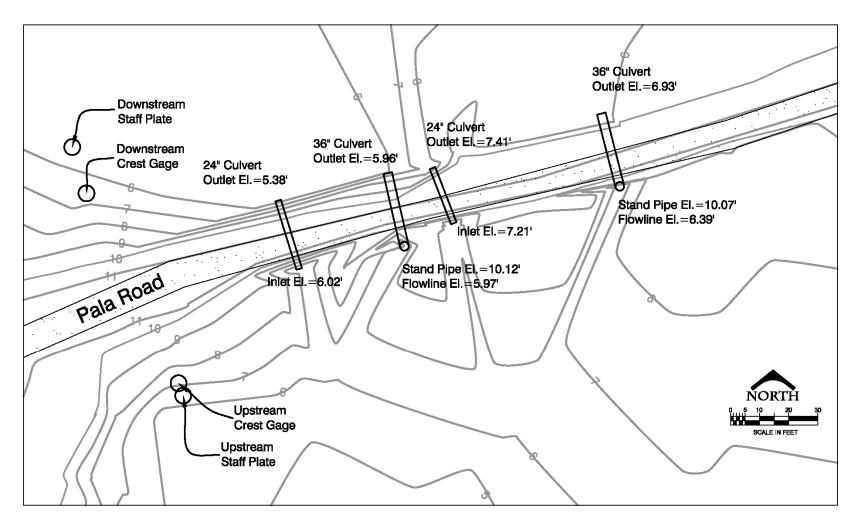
Plan view of Pala Road crossing Yontocket Slough, showing location and elevations of the two 24 inch free flowing culverts and the two 36 inch culverts with stand pipes. Also shown are the location of the staff and crest gages adjacent to Pala Road. All elevations are in NAVD88 datum.
